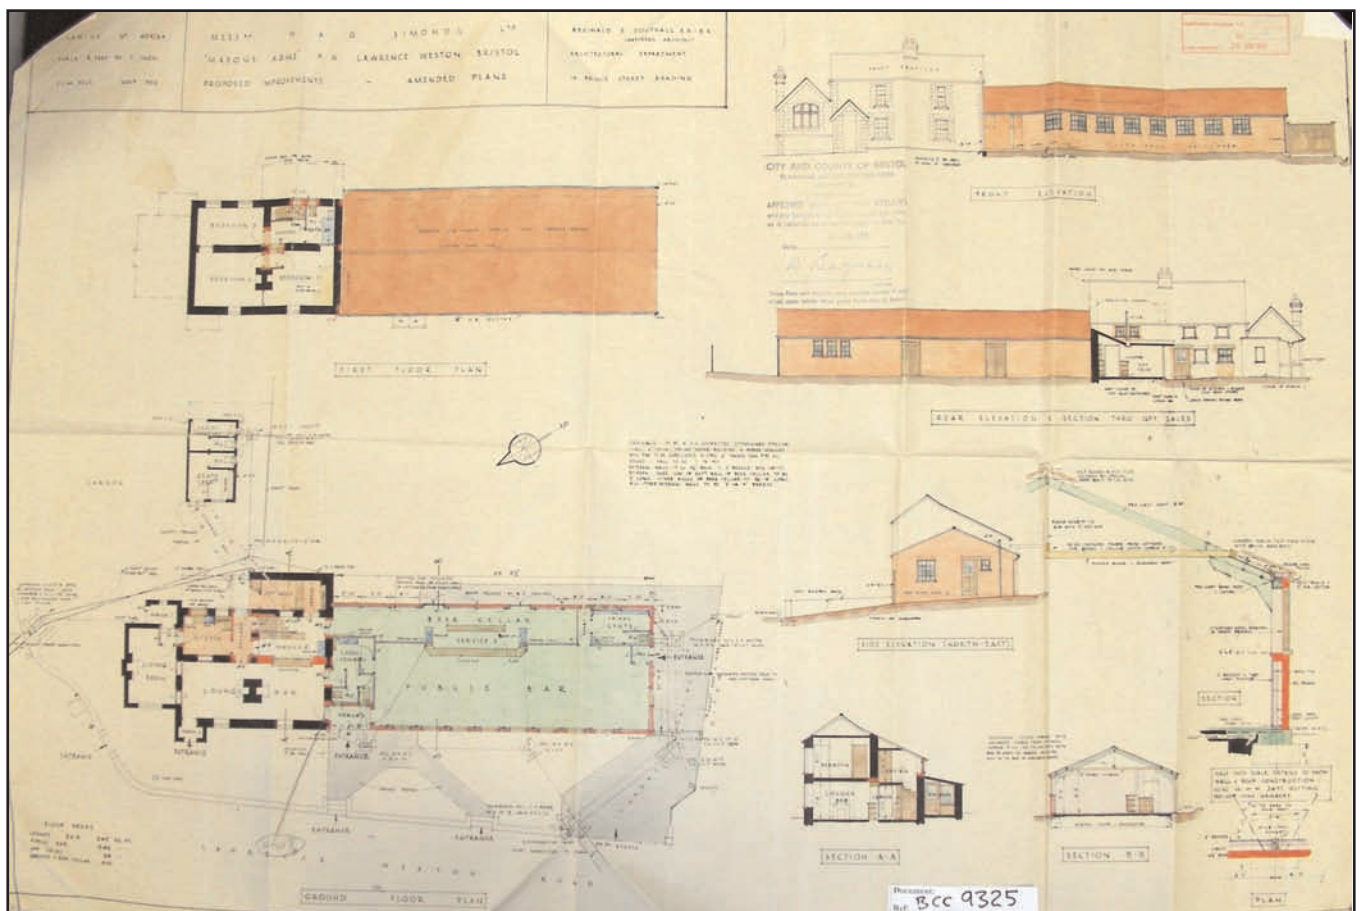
Architectural drawing (ground- & first-floor plans) for proposed alterations and extension to the Masons Arms, dated 1952 (BCC)
